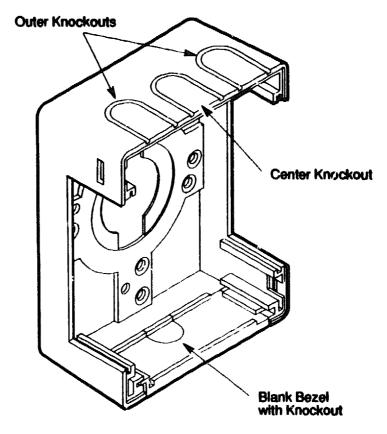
Hardwall Mounted Ganged Wallboxes
